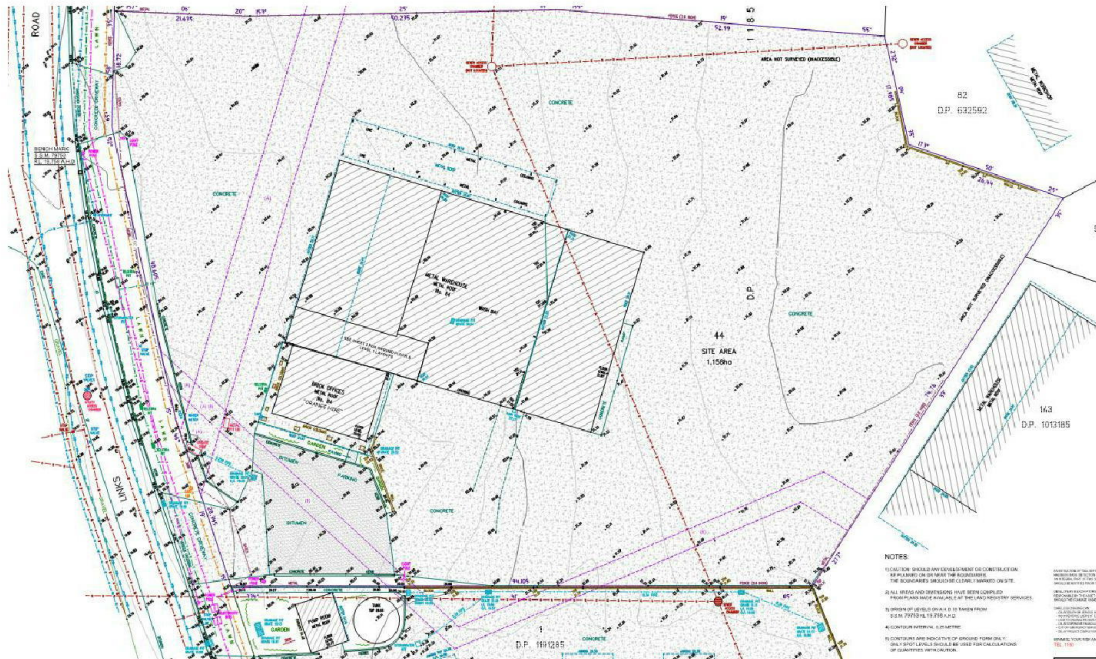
Site Subdivision Plan (Source: Bee and Lethbridge)
